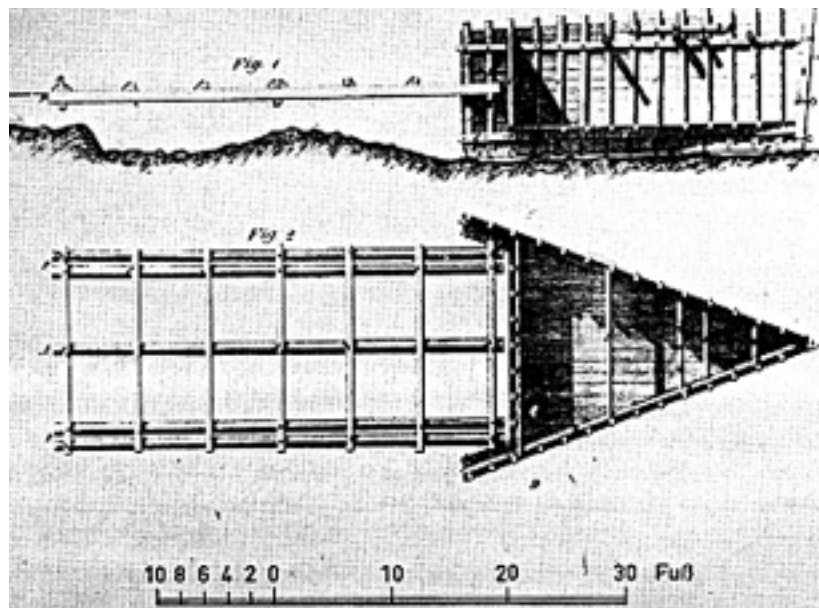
Working installation of 1830 (Fuss = foot) (cross-section and plan view)
